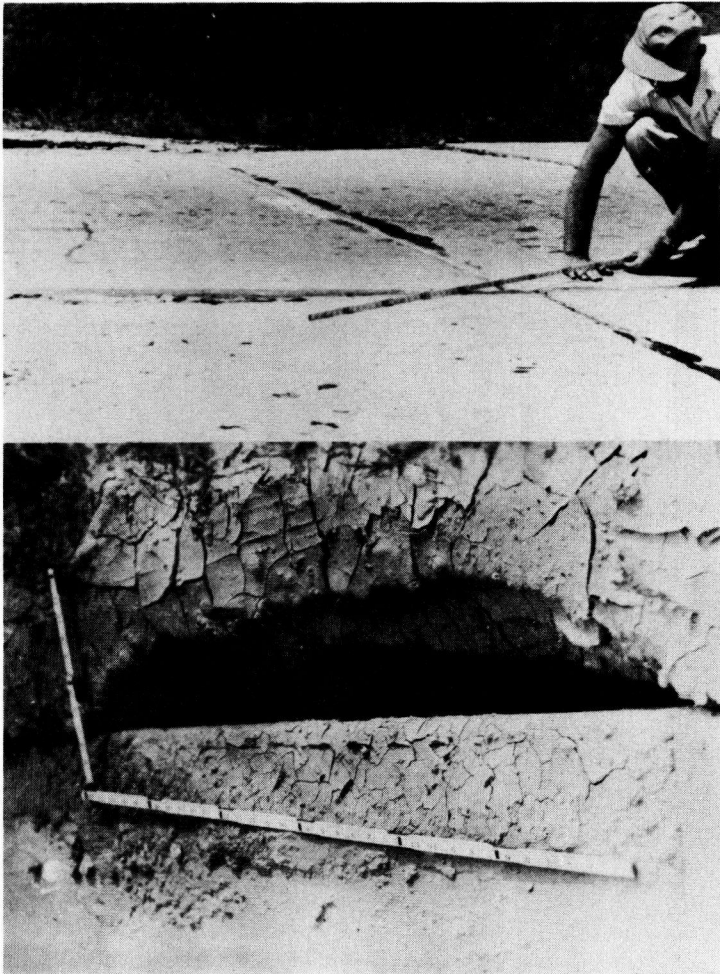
Faulting and pumping of plain concrete pavement in spring of 1954. (15-foot joint spacing, no subbase). Top: Pavement slabs have been depressed at joint and have transverse crack about 8 feet from joint. Bottom: Slurry and blow-hole at outer edge of pavement (upper-left portion of top).
